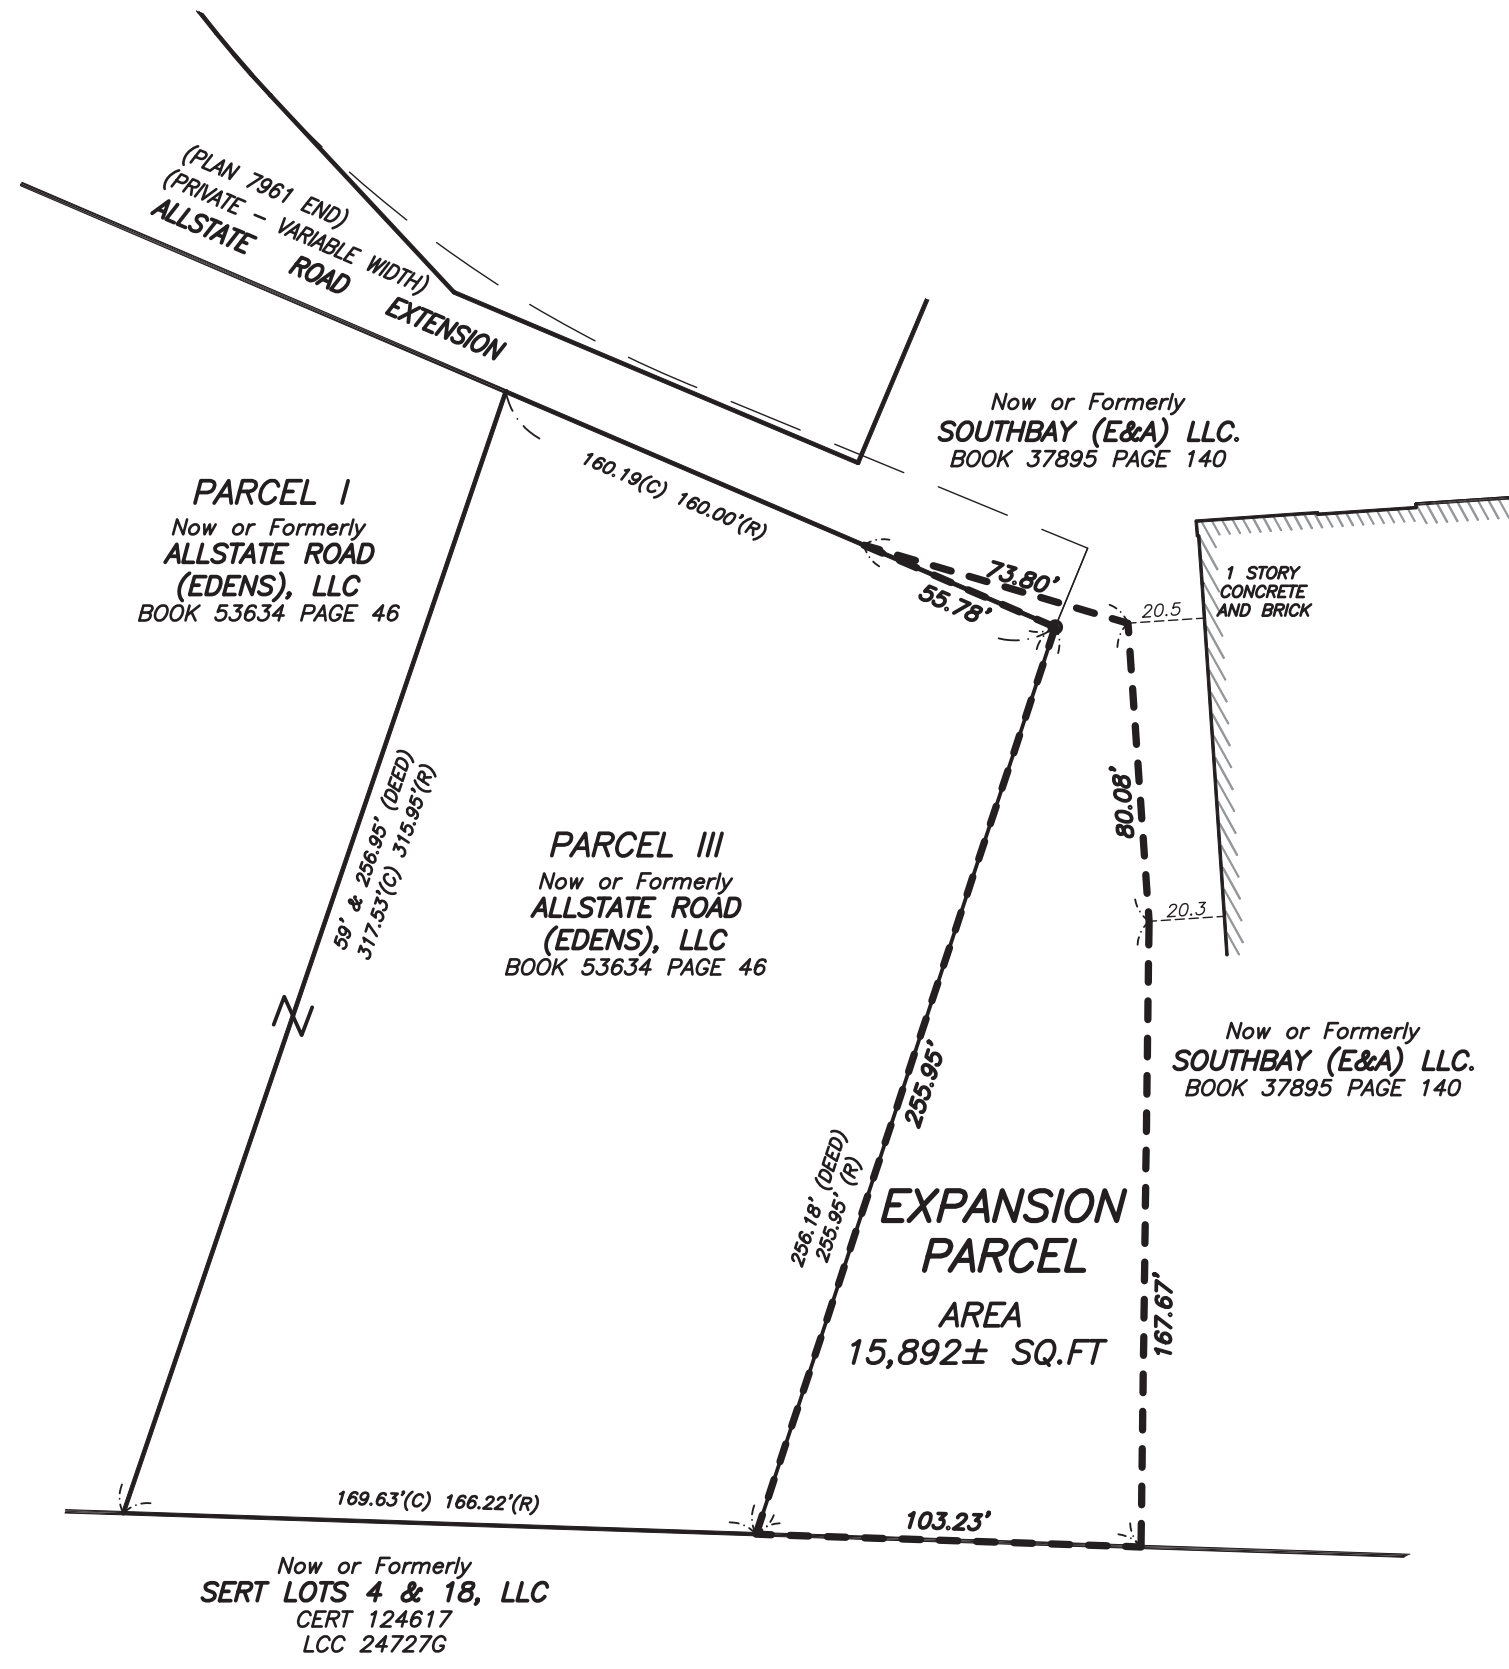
EXHIBIT PLAN SHOWING EXPANSION PARCEL
